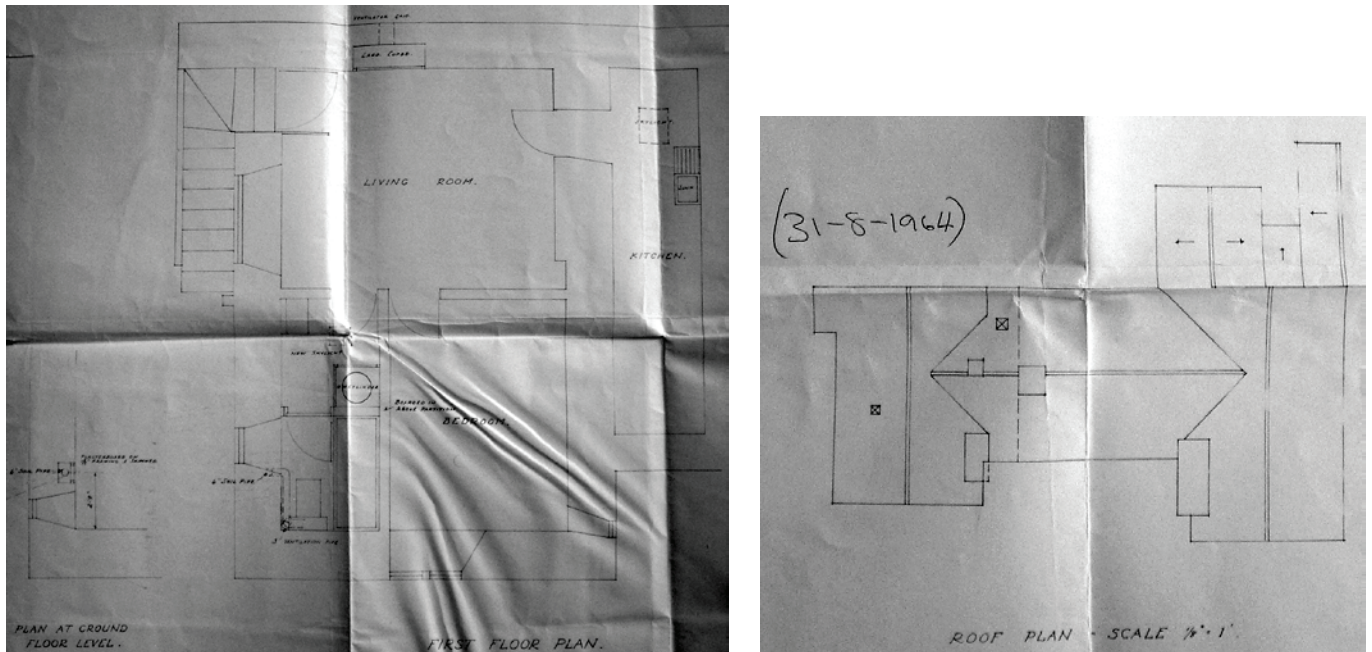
Plans associated with a planning application submitted in 1964 (CAC(K) WSMB/K/11/4/3777 1964)
